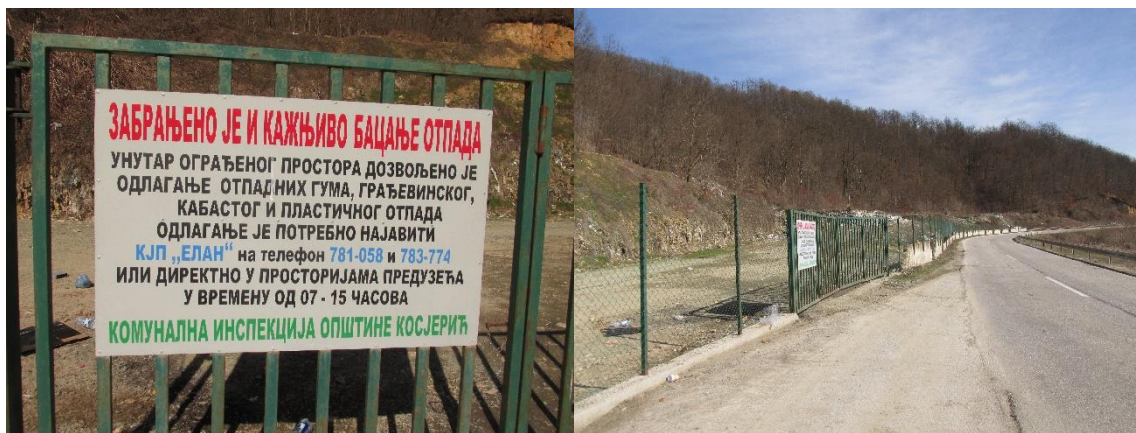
Landfill on the subject road section from km 186+890 to km 187+110
